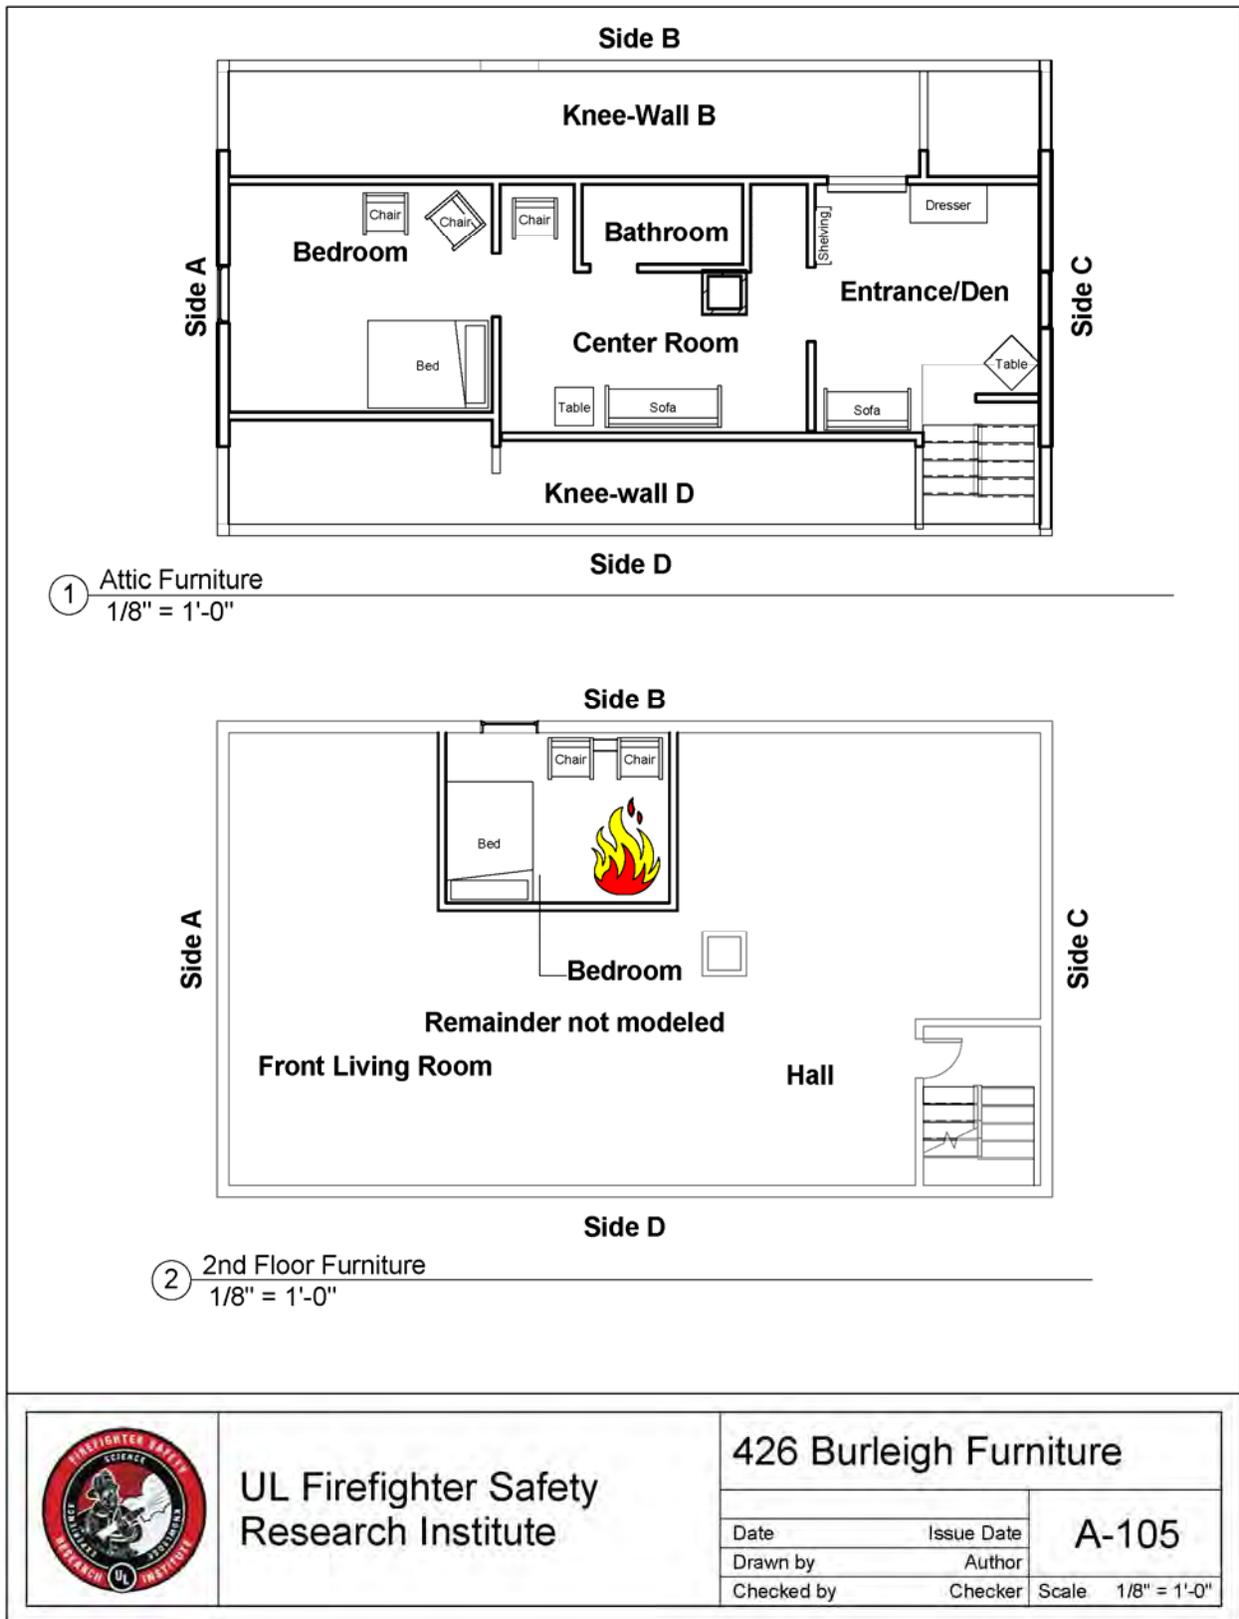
Experiment 2 – 426 Burleigh Street Furniture Layout
